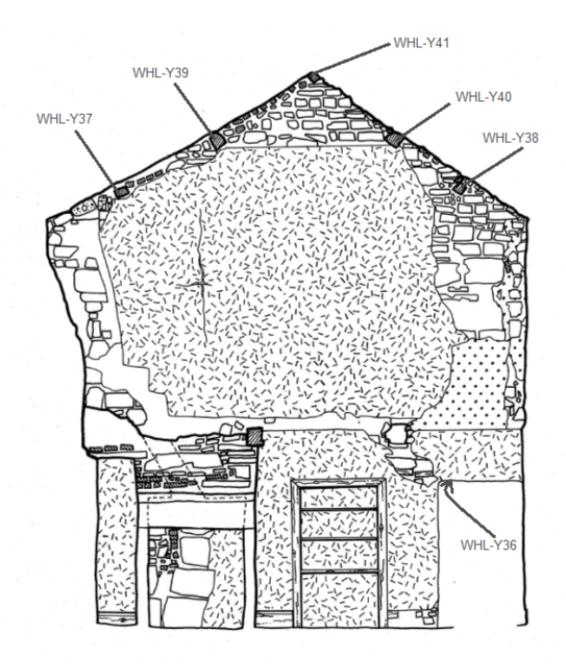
Interior wall between stables and bothy (west face), showing the location of sample WHL-Y36-41 (LUAC 1997)
